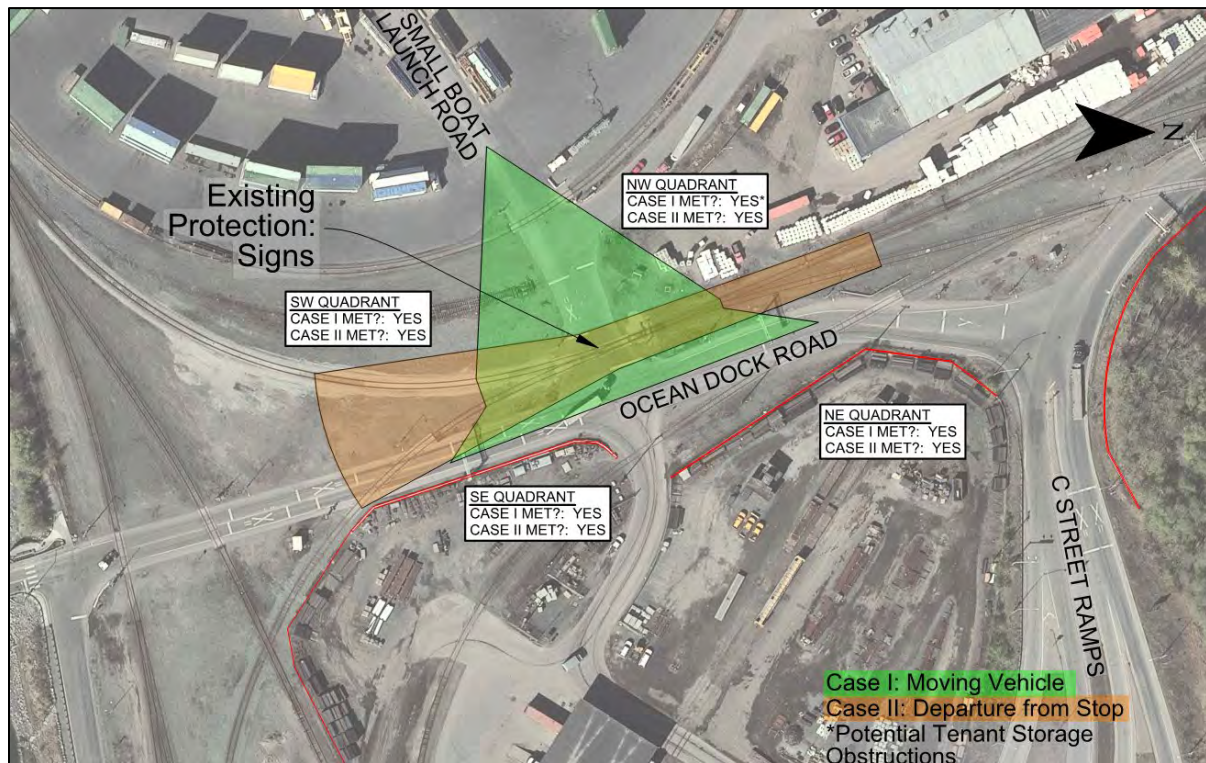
Rail-Road Small Boat Launch Road Crossing 1 Sight Triangles
